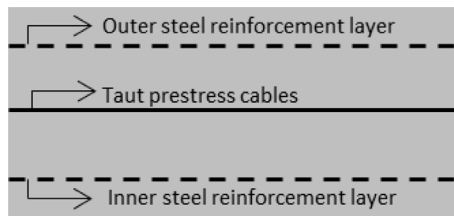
The cross section of the reinforced and prestressed lightweight concrete shell considered in this work.
